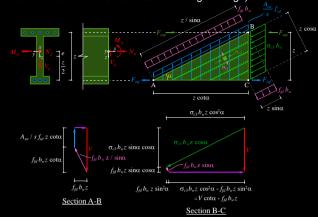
Transverse and fibre reinforcing components of SFRC beams with stirrups failing in shear (Foster, 2014).
